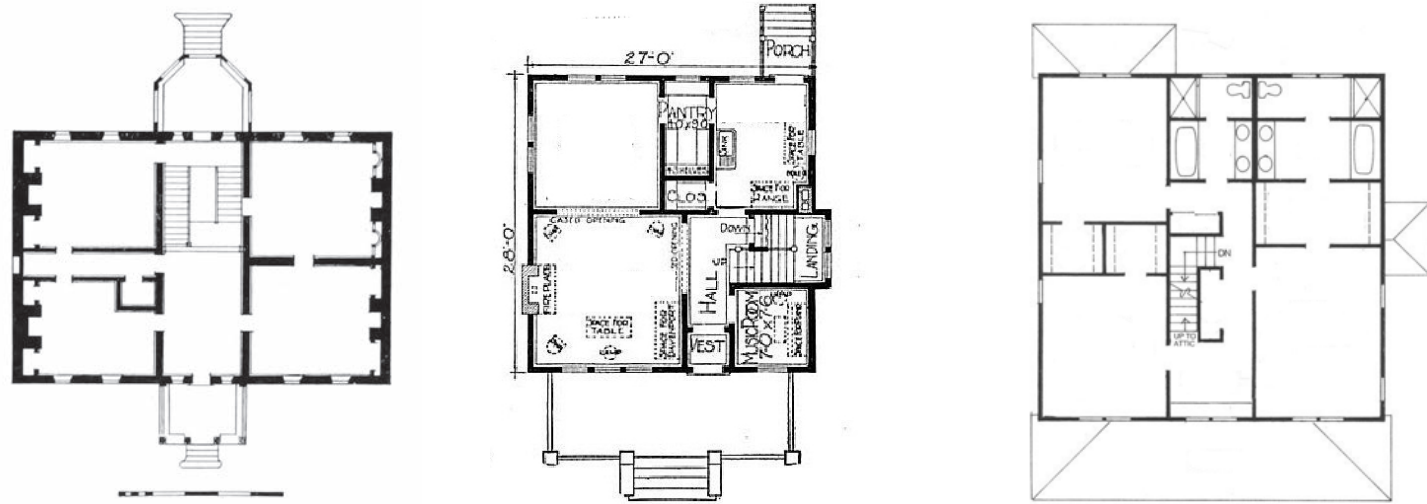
Gunson Hall, Lorton, VA, example of a Georgian villa. Plan as it appeared in the early 20th century, prior to restoration (left); a typical American Foursquare plan (catalog house) (center); and a developed foursquare plan (right).
